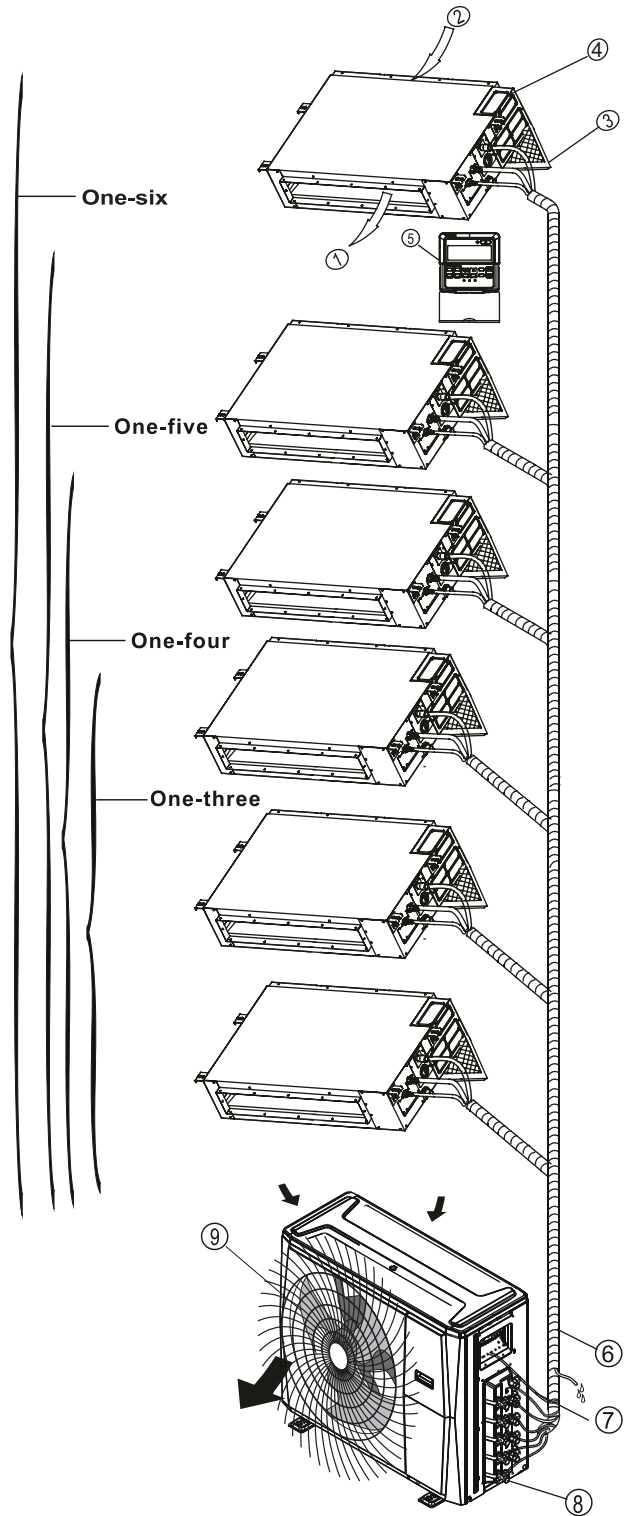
Duct/Ceiling Type Indoor Unit
